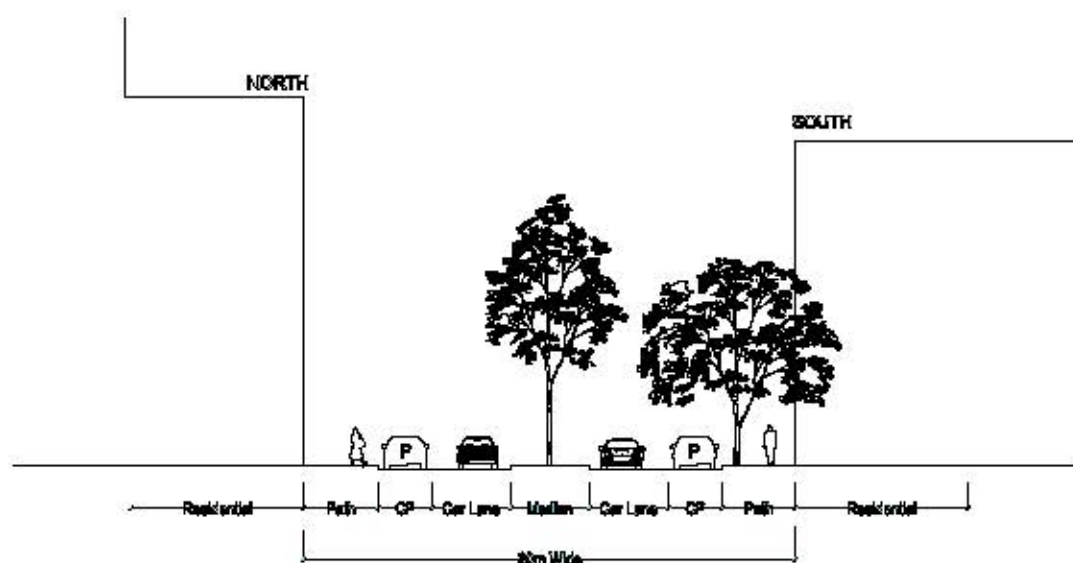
Indicative Jeffcott Street section between Spencer Street and King Street looking east.
